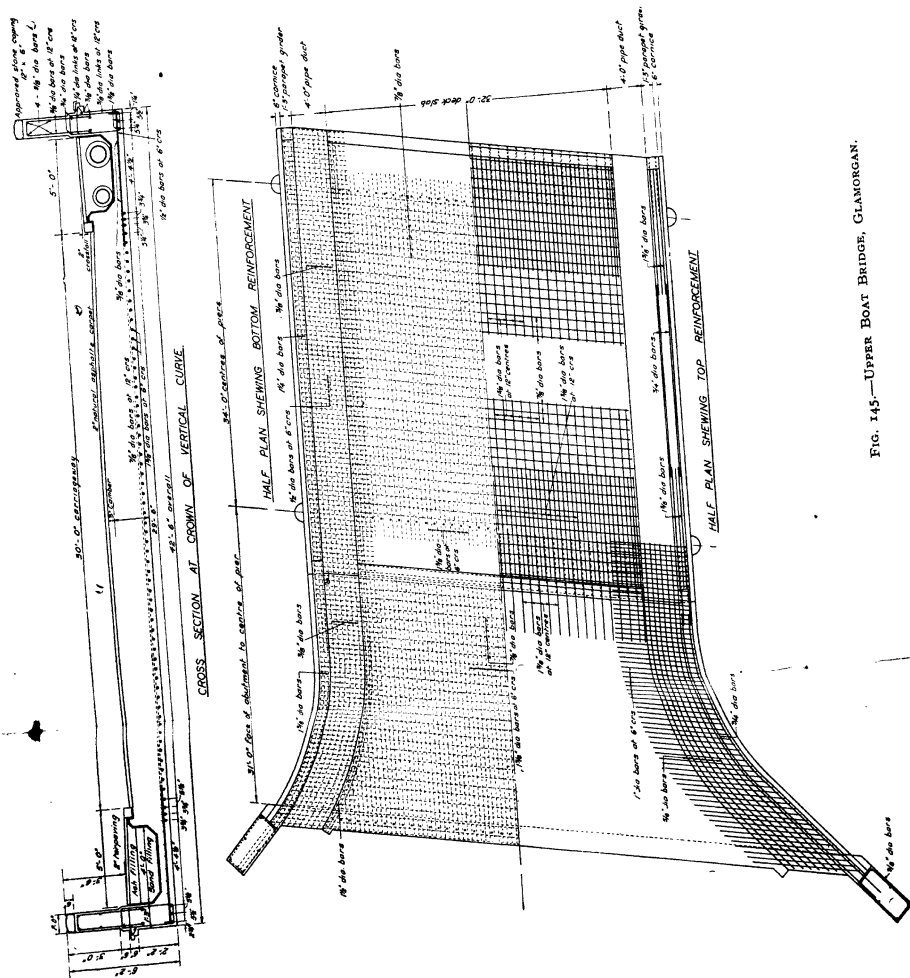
UPPER BOAT BRIDGE, GLAMORGAN.
